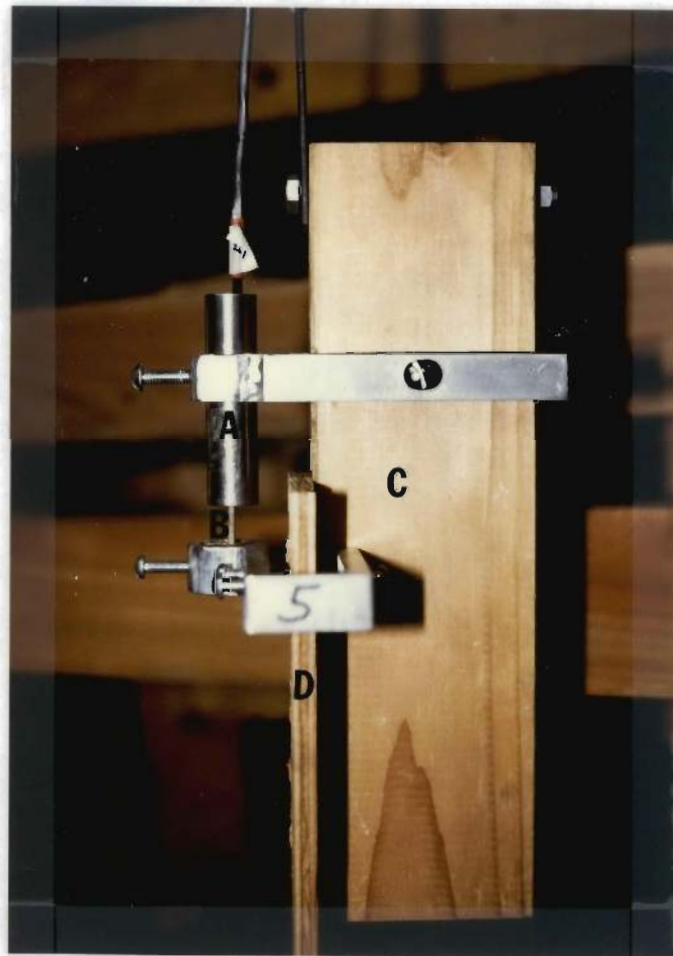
Testing arrangement for varying-load tests; A = LVDT, B = string to LVDT core, C = stud and D = plywood.
